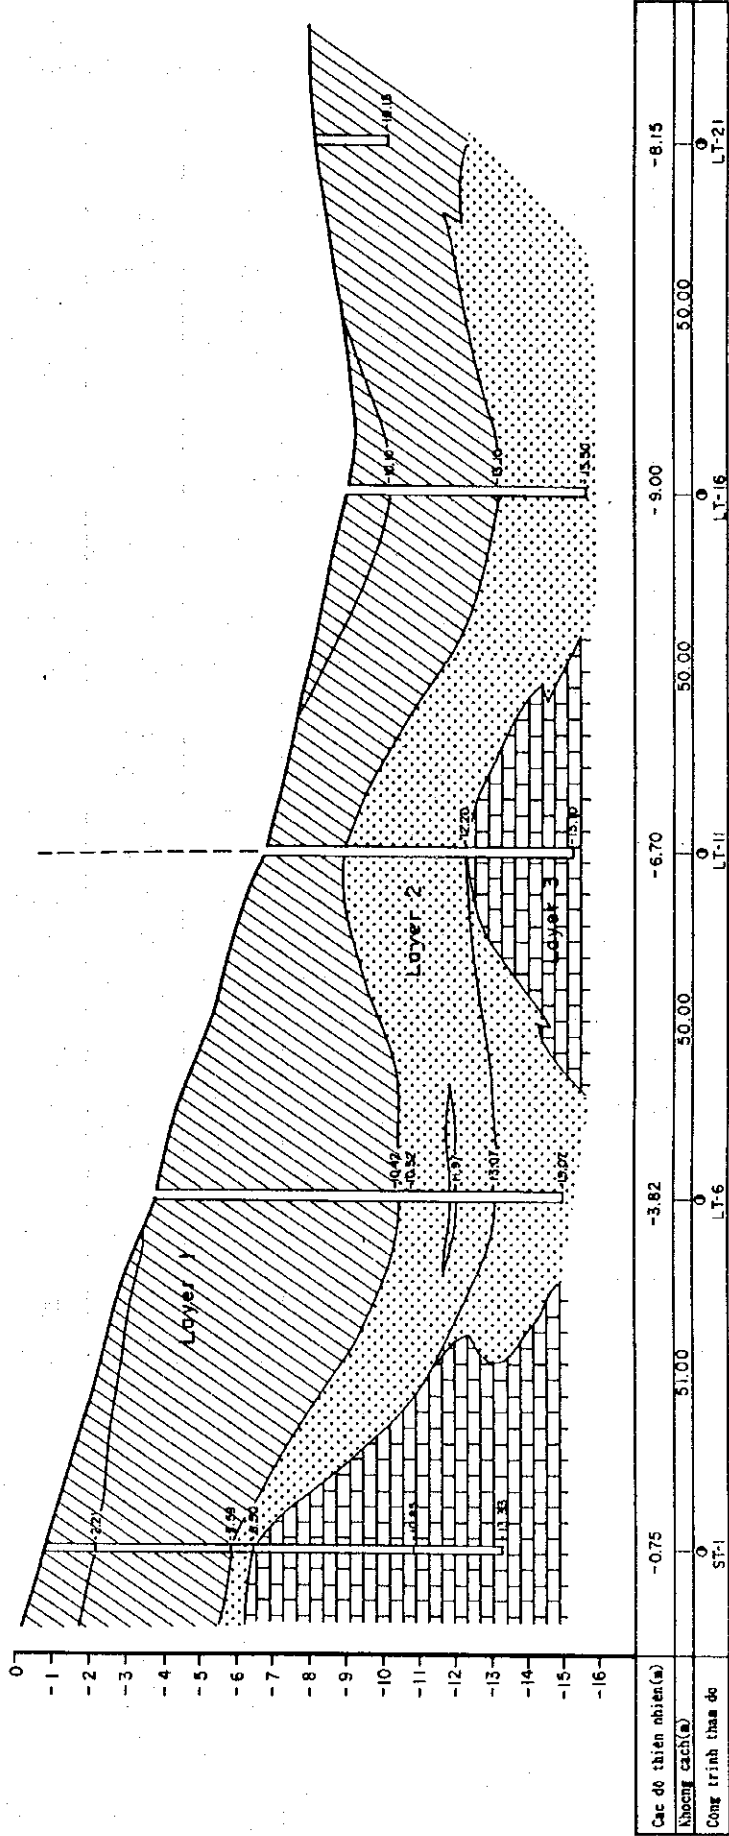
Geological Cross-section at Berth No.1 of Cailan Port
